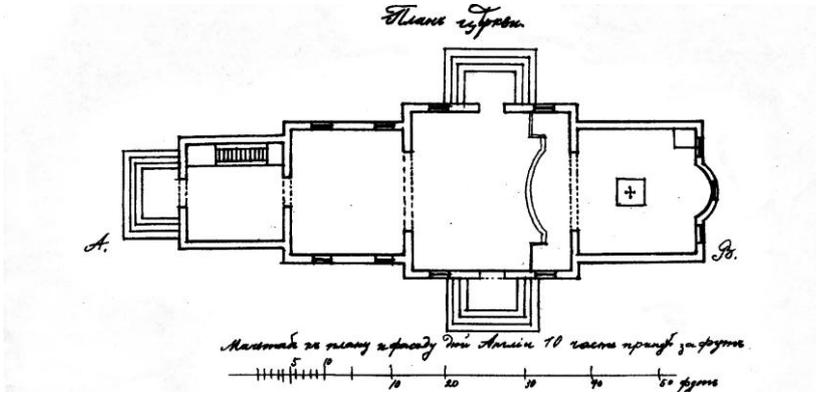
Exemplary wooden church for the Orenburg Defence Line, on a stone foundation: ground plan
